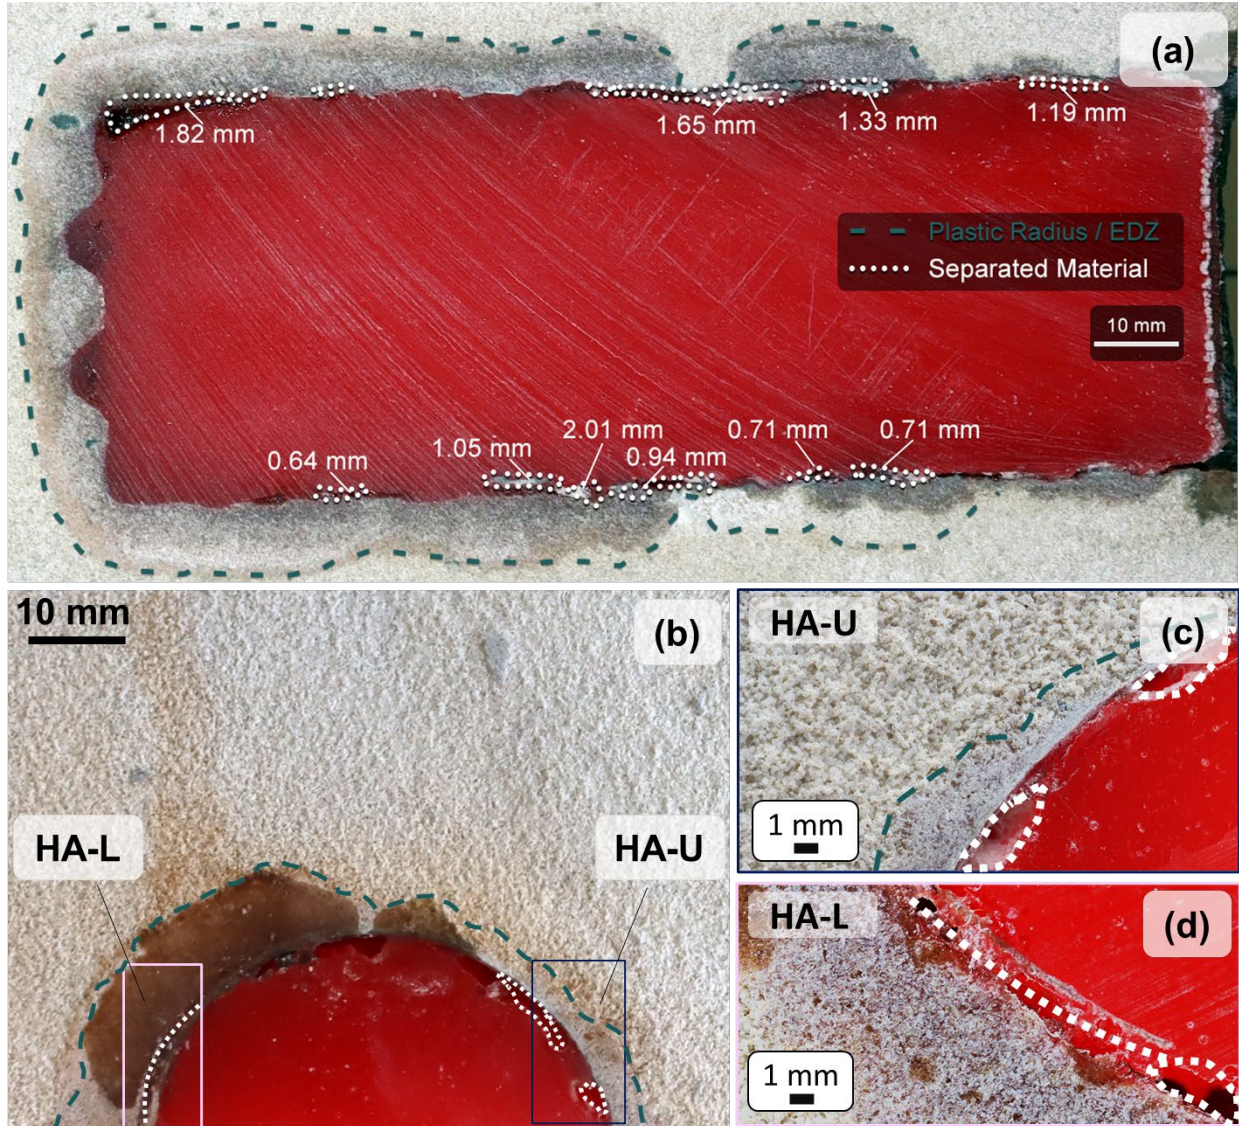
(a) Longitudinal section of the recovered specimen with cured epoxy resin (red color), (b) half-axial section located 100 mm from the tunnel portal. Epoxy resin was injected into the opening after the final loading stage to preserve final deformation. Annotations show the infiltrated resin (plastic radius  $R_p$  or EDZ) and the thickness of spalled rock observed in the section. (c) and (d) provide a closer view of the tunnel damage observed in (b). (For interpretation of the references to color in this figure legend, the reader is referred to the Web version of this article.)
